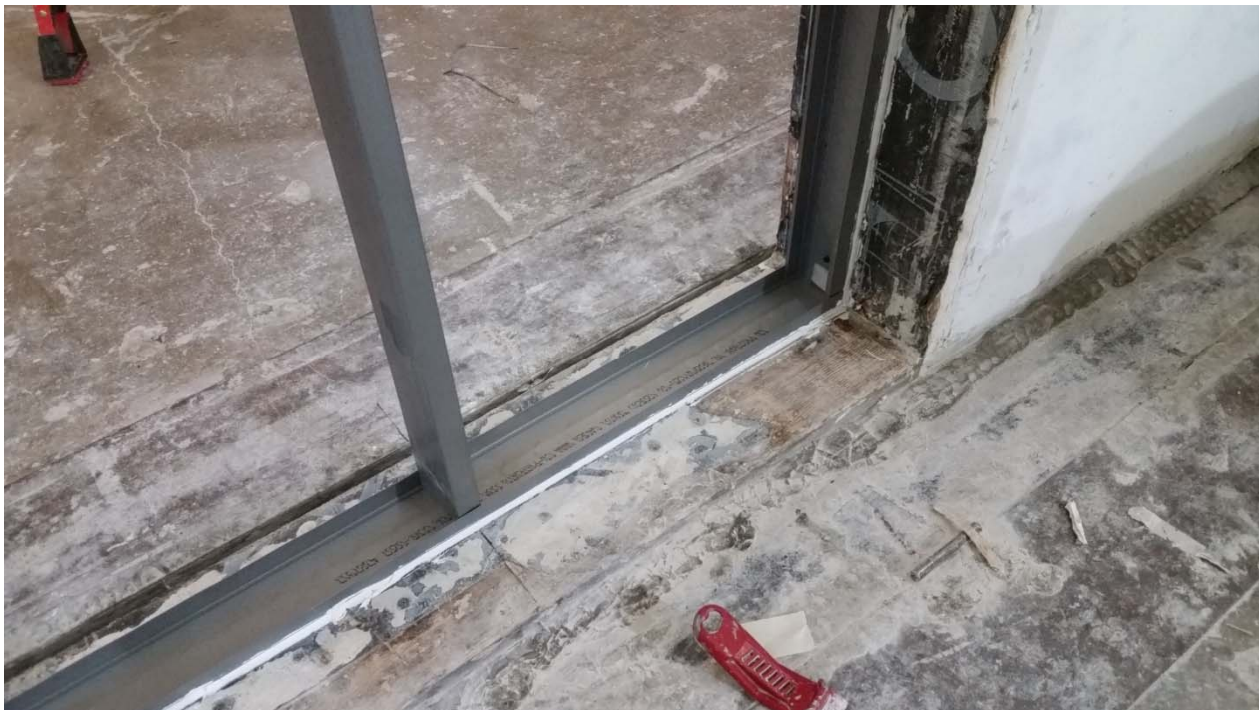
Detail of installation and sealing of perimeter framing members, floating stud
